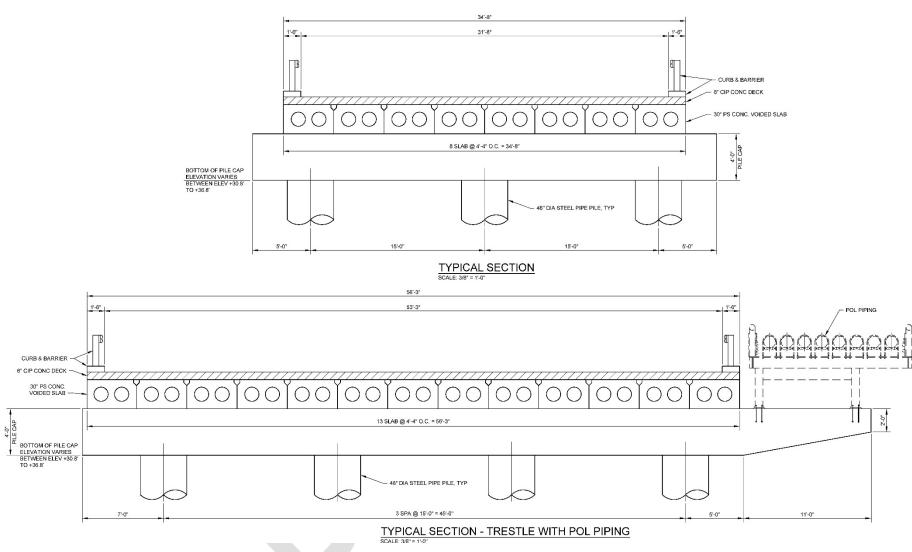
Typical Section for Typical and POL Access Trestles: Alternative 1A with 48-inch-diameter Driven Piles
